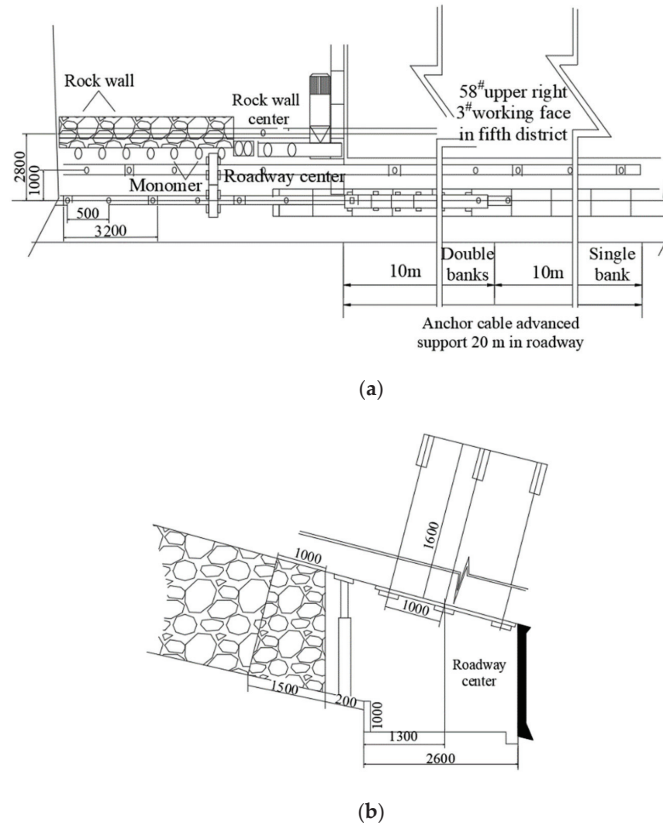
Views of gob-side entry retaining in 58[#] upper right 3[#] working face: (a) plan view; (b) sectional view.
